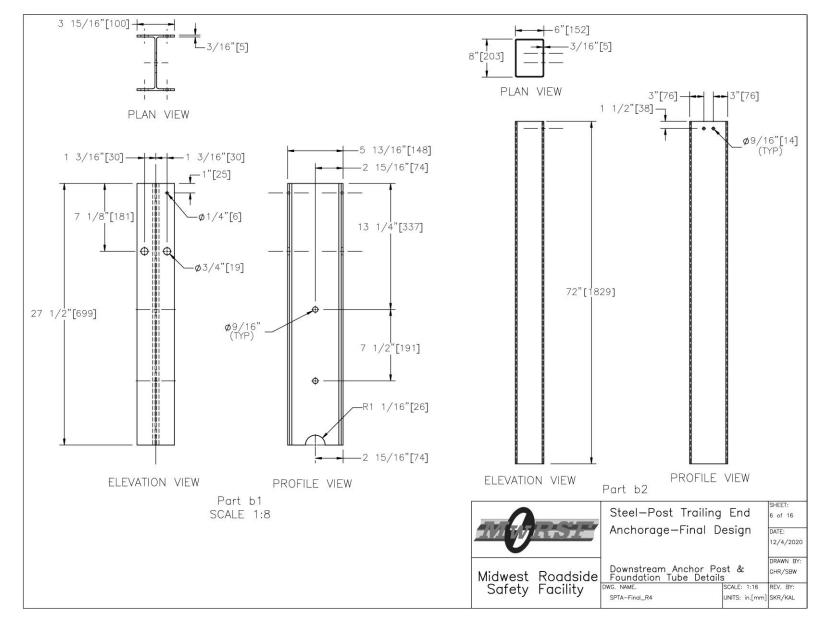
Steel-Post Trailing End Anchorage, Downstream Anchor Post and Foundation Tube Details
